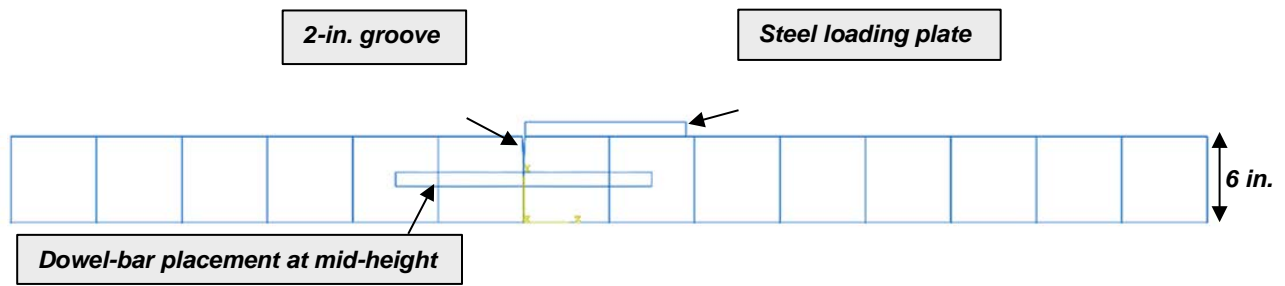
Elevation view showing solid modeling of the jointed-pavement.
